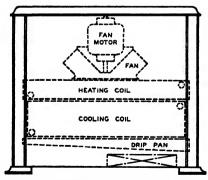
Remote Floor Type Room Unit Air Conditioner
